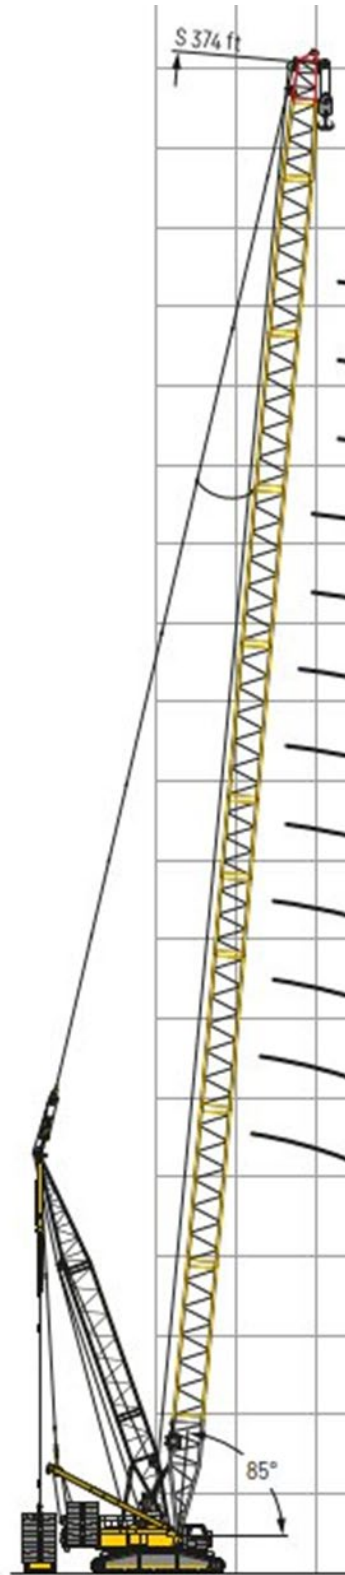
Schematic of Typical Large Crawler Crane to Be Used
